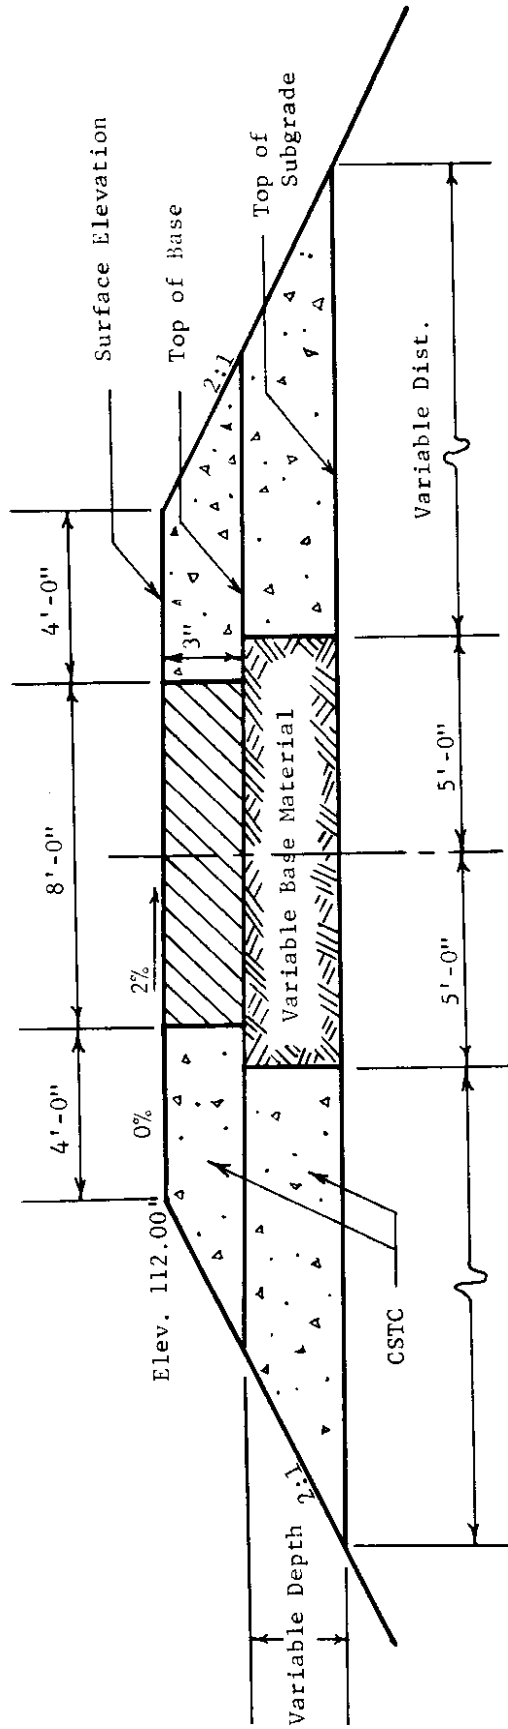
TYPICAL CROSS-SECTION OF PAVEMENT STRUCTURE
